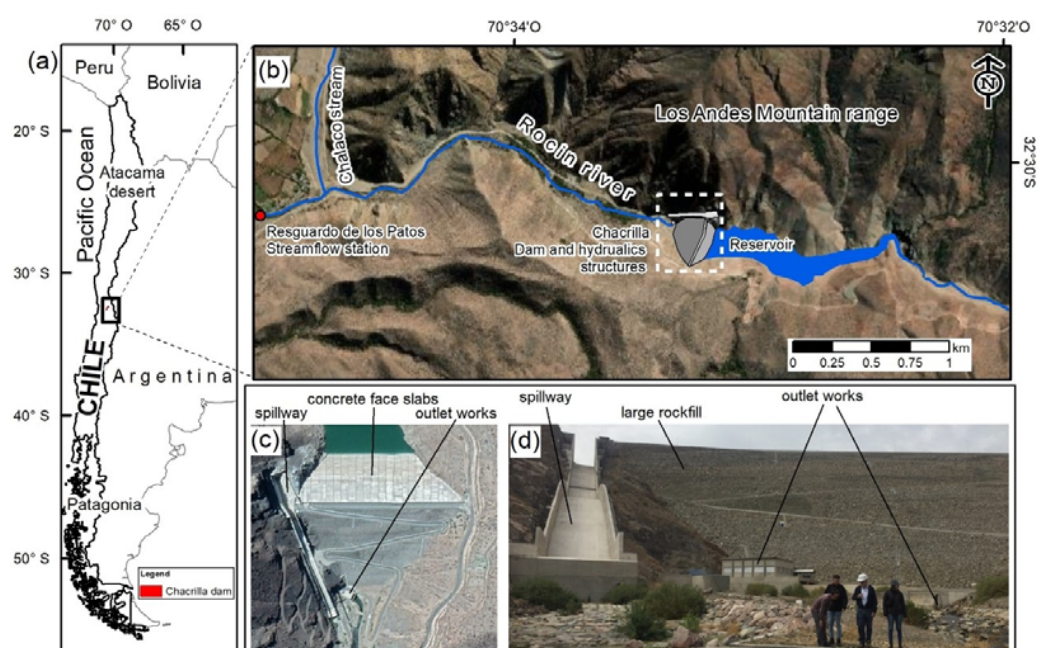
(a,b) Location of the Chacrillas Reservoir; (c) Zoom of the Chacrillas Reservoir with outlet works and concrete face slabs; (d) Zoom of the spillway.
